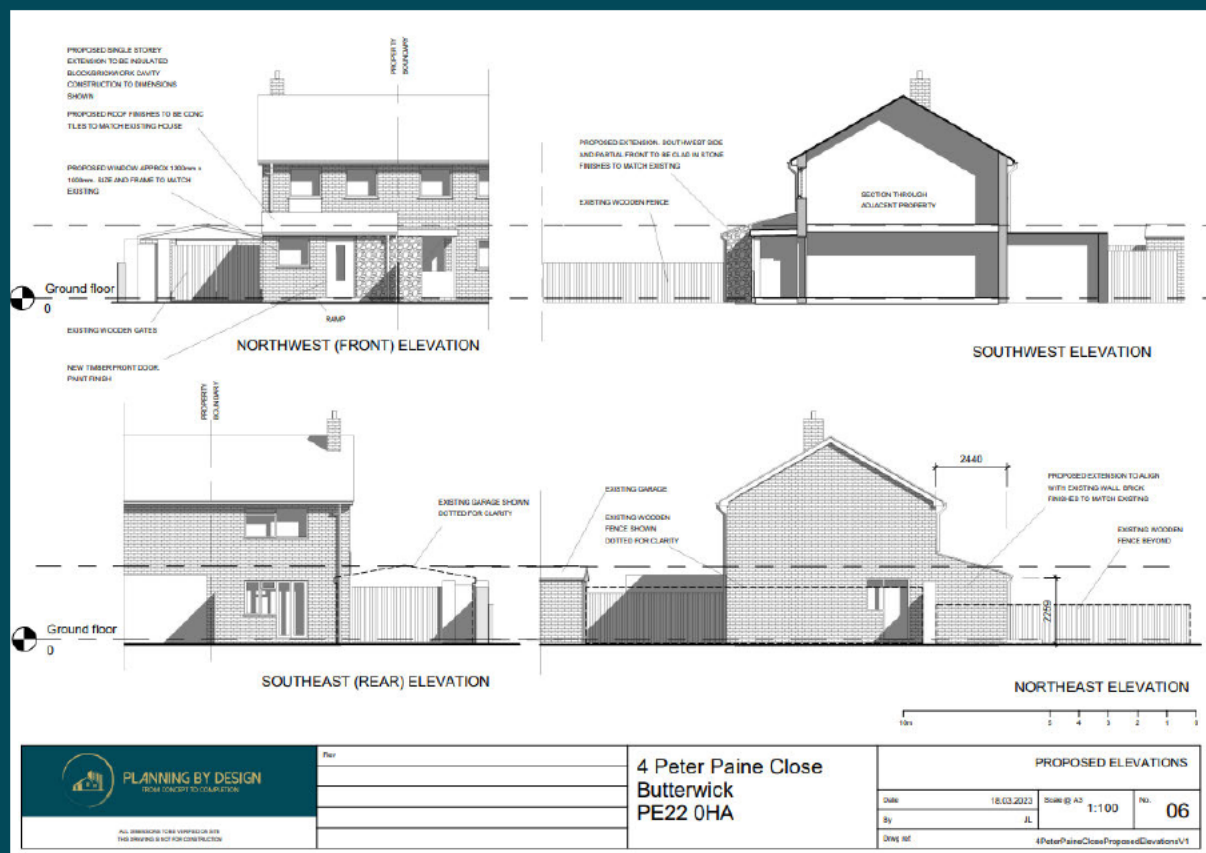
Proposed Elevations (not to scale, see planning drawings and design)
